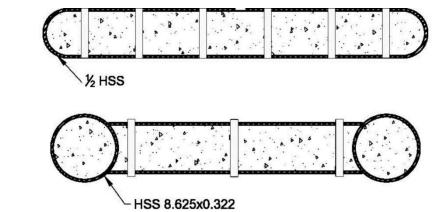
Configurations of Concrete Encased Composite Plate Walls
